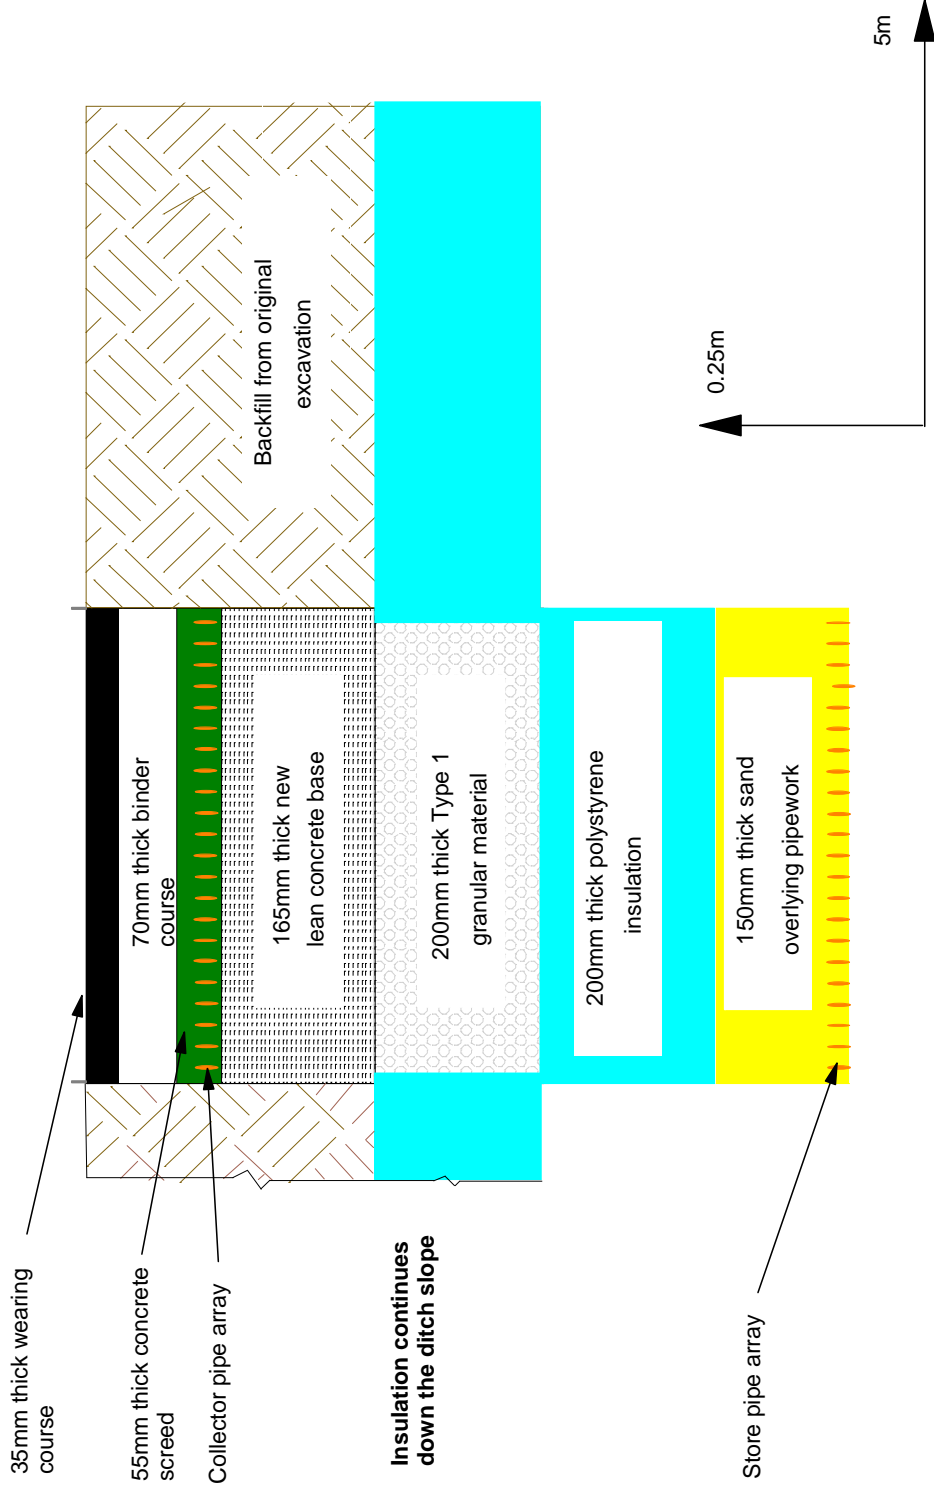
Cross-section through collector 2 and the under-road store 2
